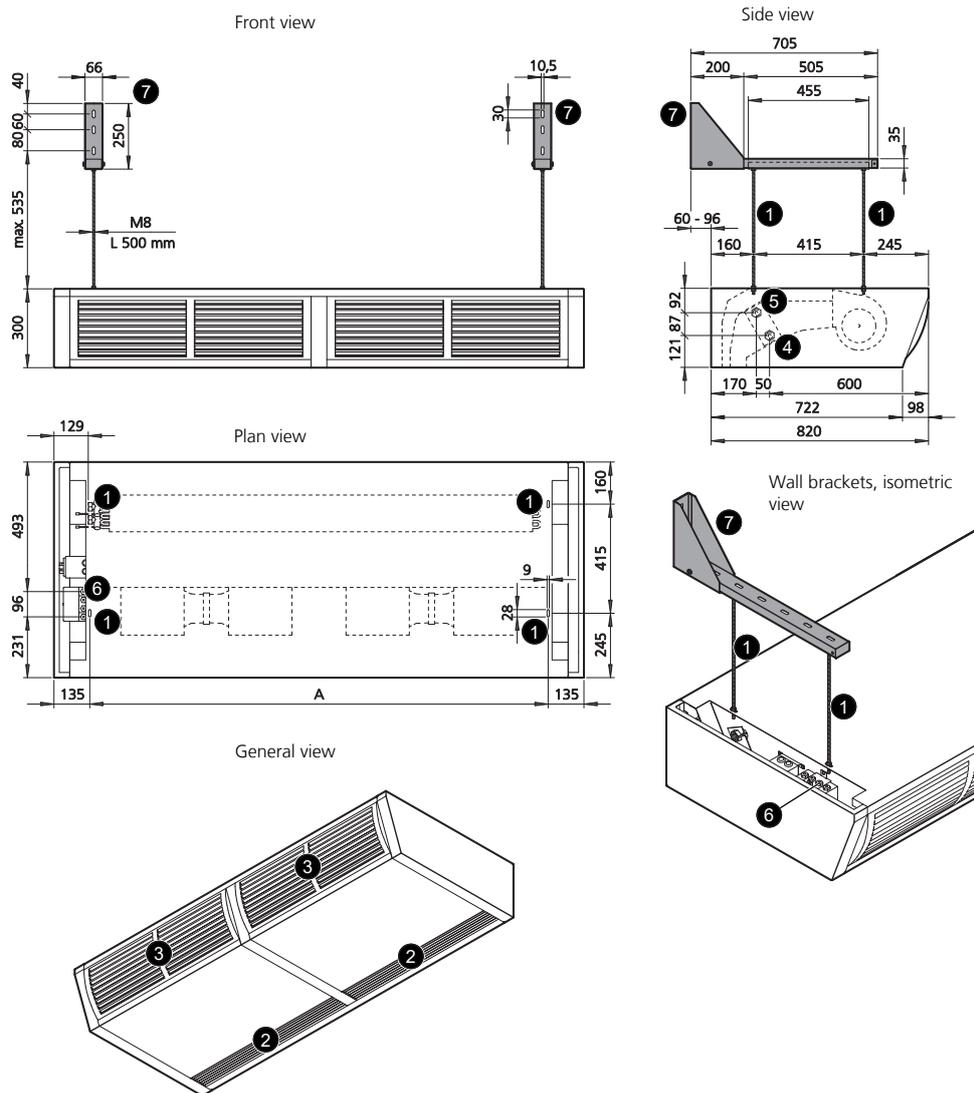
Suspension points for Tandem 300 model 12 - 30 with wall brackets
